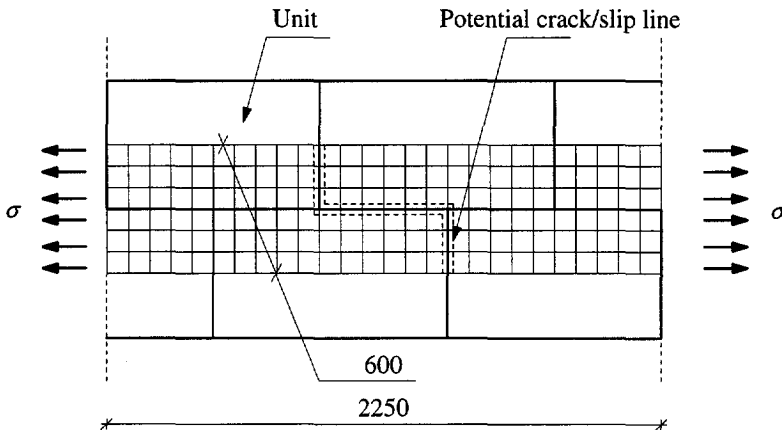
Masonry detail of an infinitely long wall under tensile loading parallel to the bed joints.
